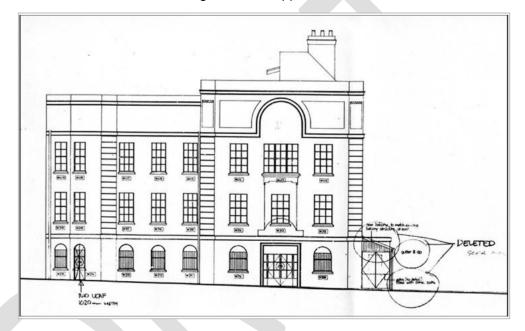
1982 front, George Street elevation. Note the proposed alteration of the ground floor window to a two leaf door in the north eastern, ground floor façade (bottom left). (Source: City of Sydney Archives 539/1/82)
